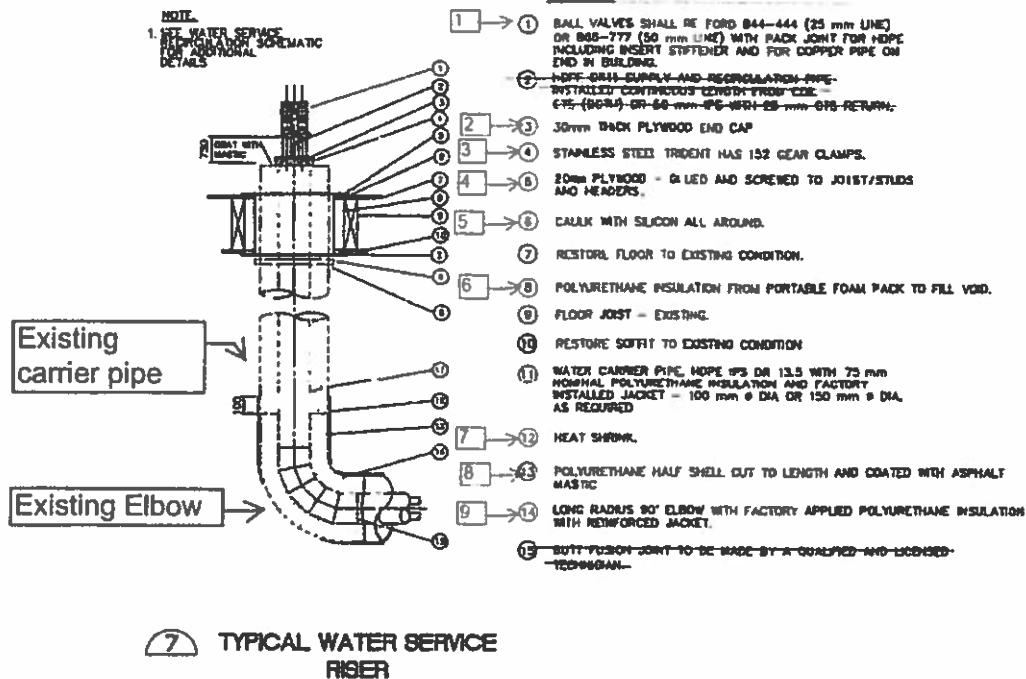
Detail 7 - from drawing C-330 - Water service connection kit for riser at building
